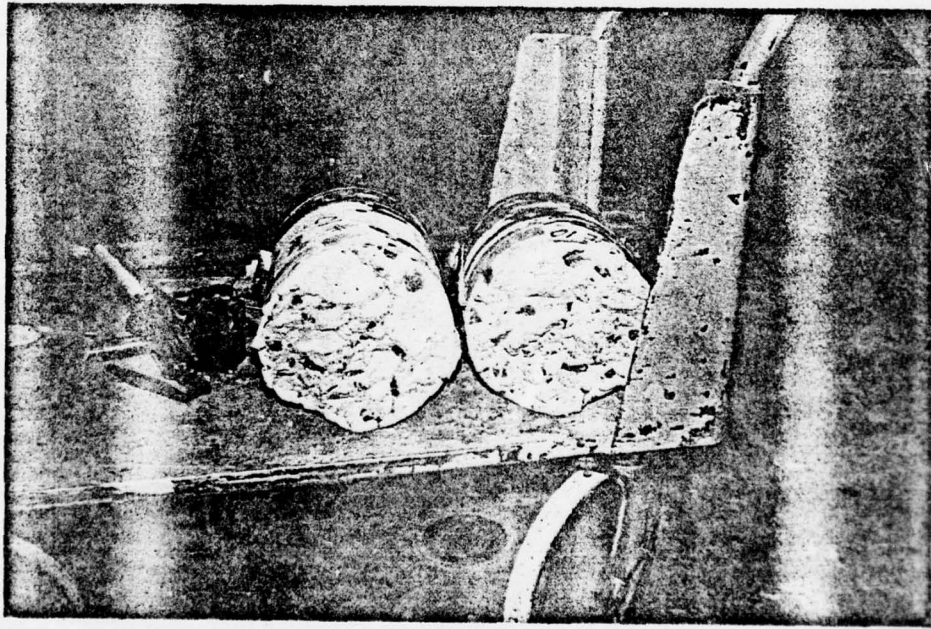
Typical Failure Surface of a Tensile Test Specimen
